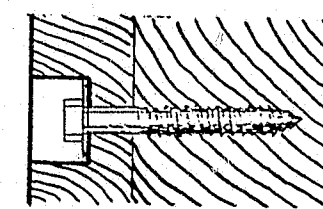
Cross section of a recessed lag screw. The sink removed from the mounted wood unit is just wide enough to accept the correct socket wrench for the fastener, which is inaccessible to pliers or adjustable wrenches.
